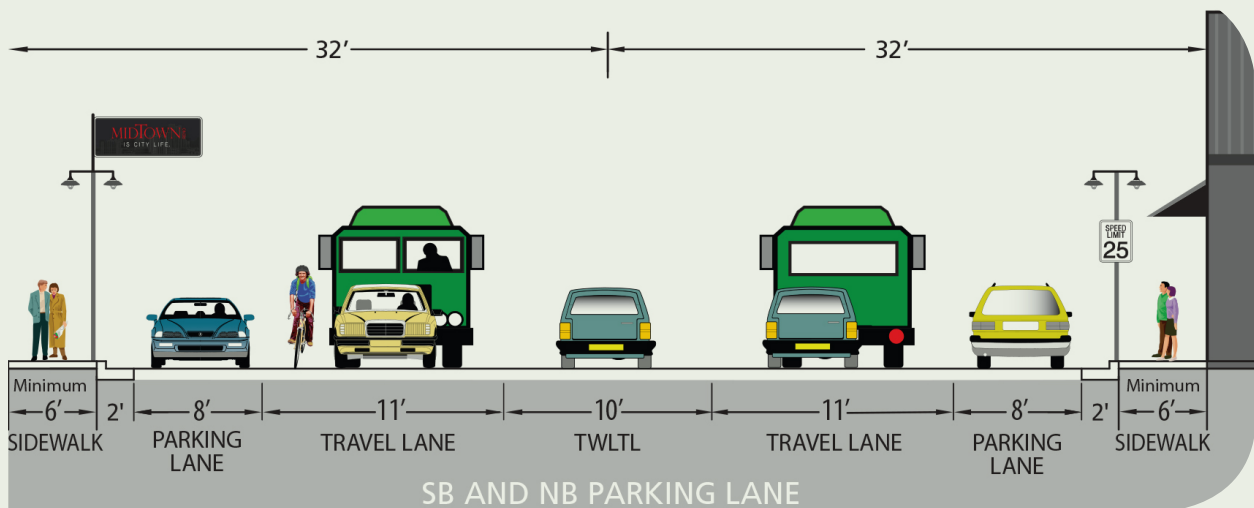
Virginia Street cross section (preliminary concept - subject to change)
